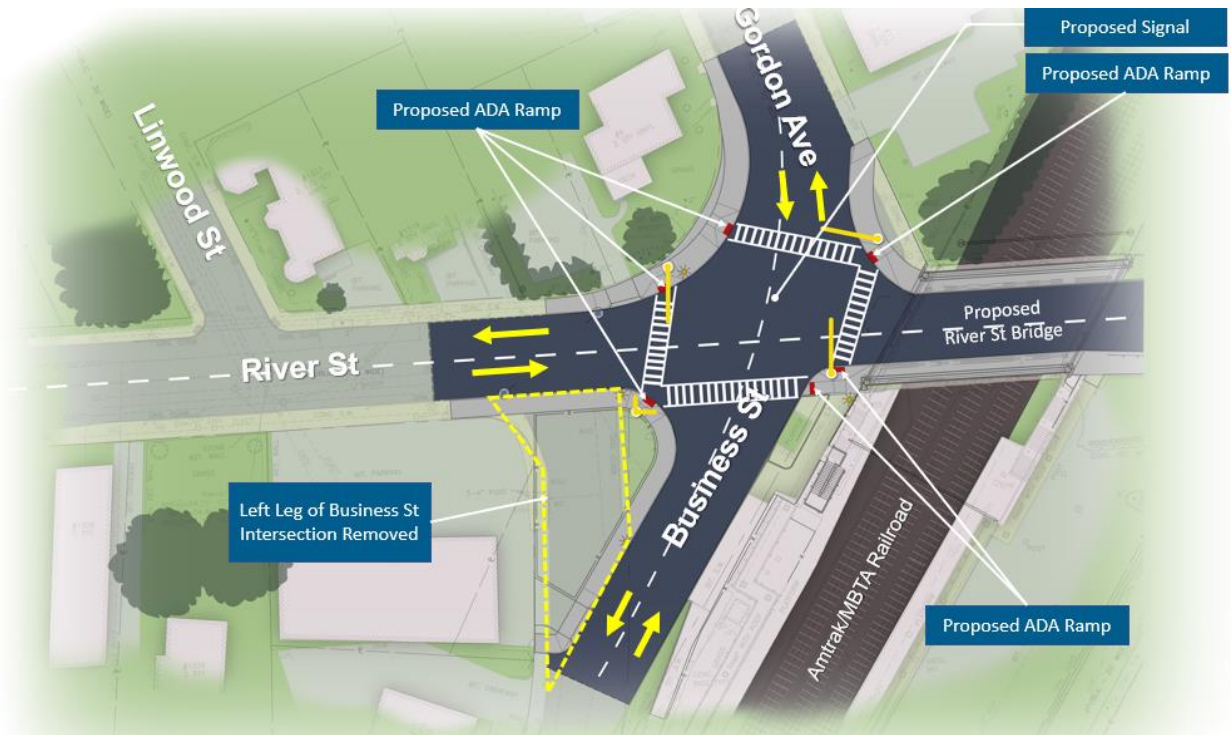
Proposed improvements to the West Street/Business Street/Gordon Avenue intersection
